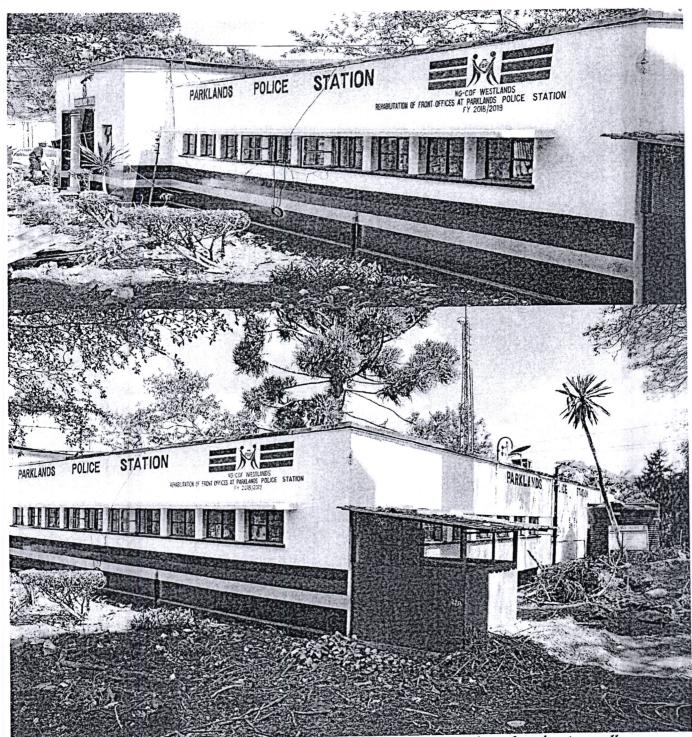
Parklands Police Station- Renovation Works and Construction of perimeter wall
